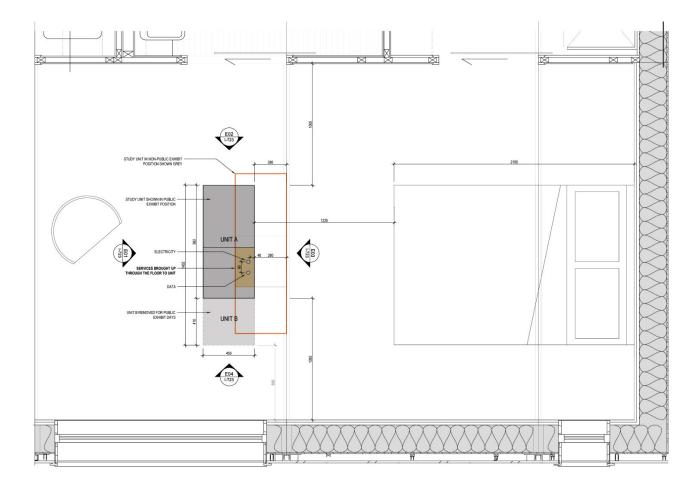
Final plan for study unit showing its intended normal position outlined in orange, its exhibition position (unit A, dark grey) and the area of floor where services could be brought up into the unit (orange shading)
